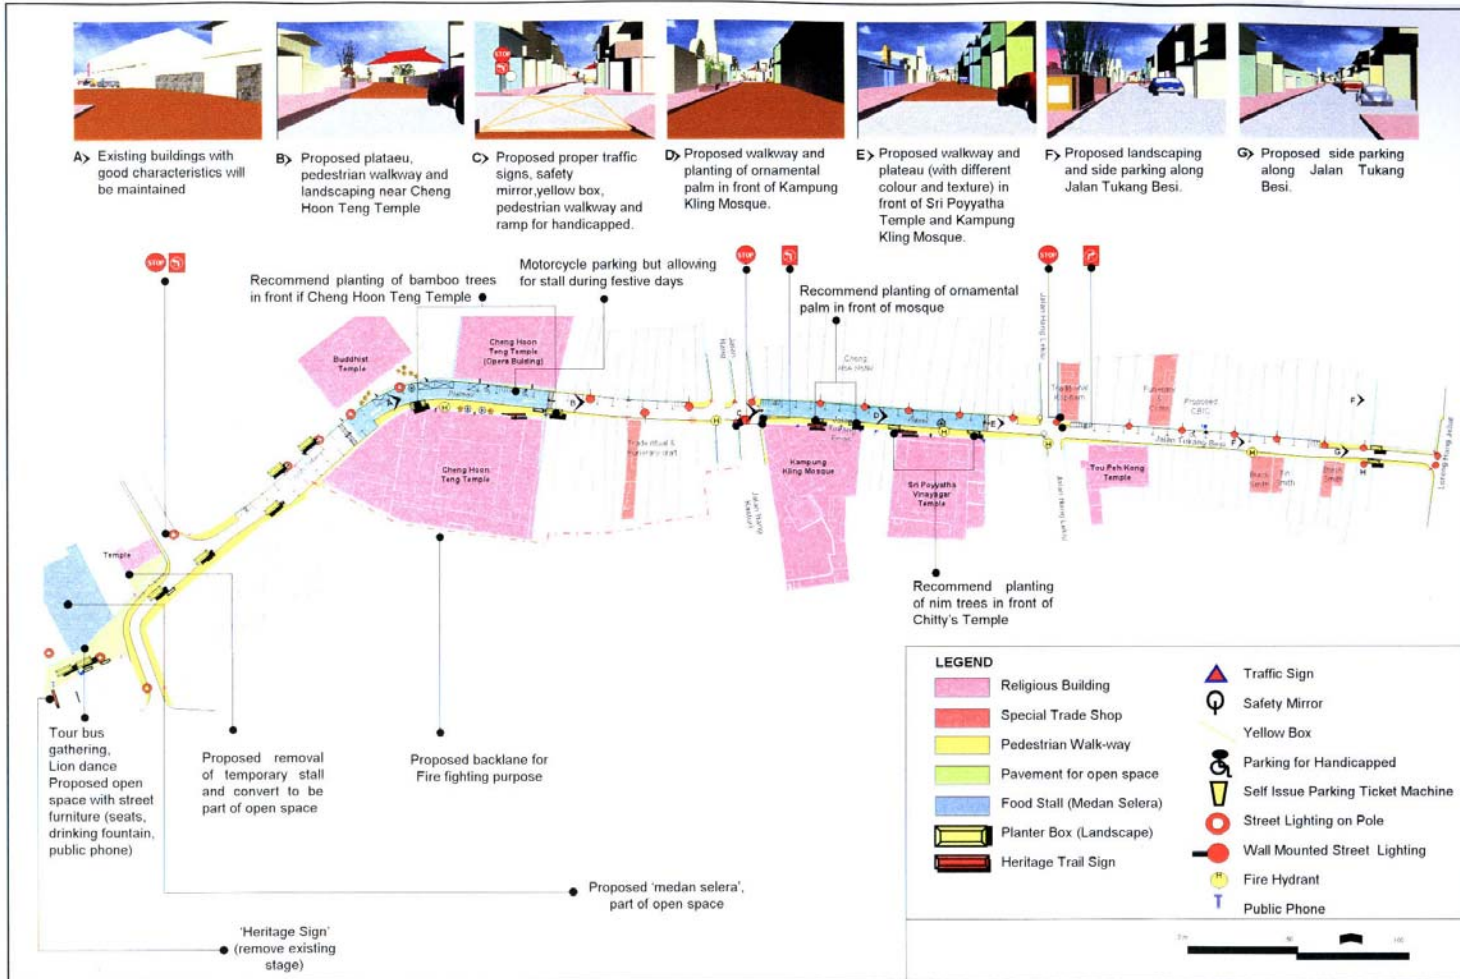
Proposed Improvements for Jalan Tokong, Jalan Tukang Emas and Jalan Tukang Besi
